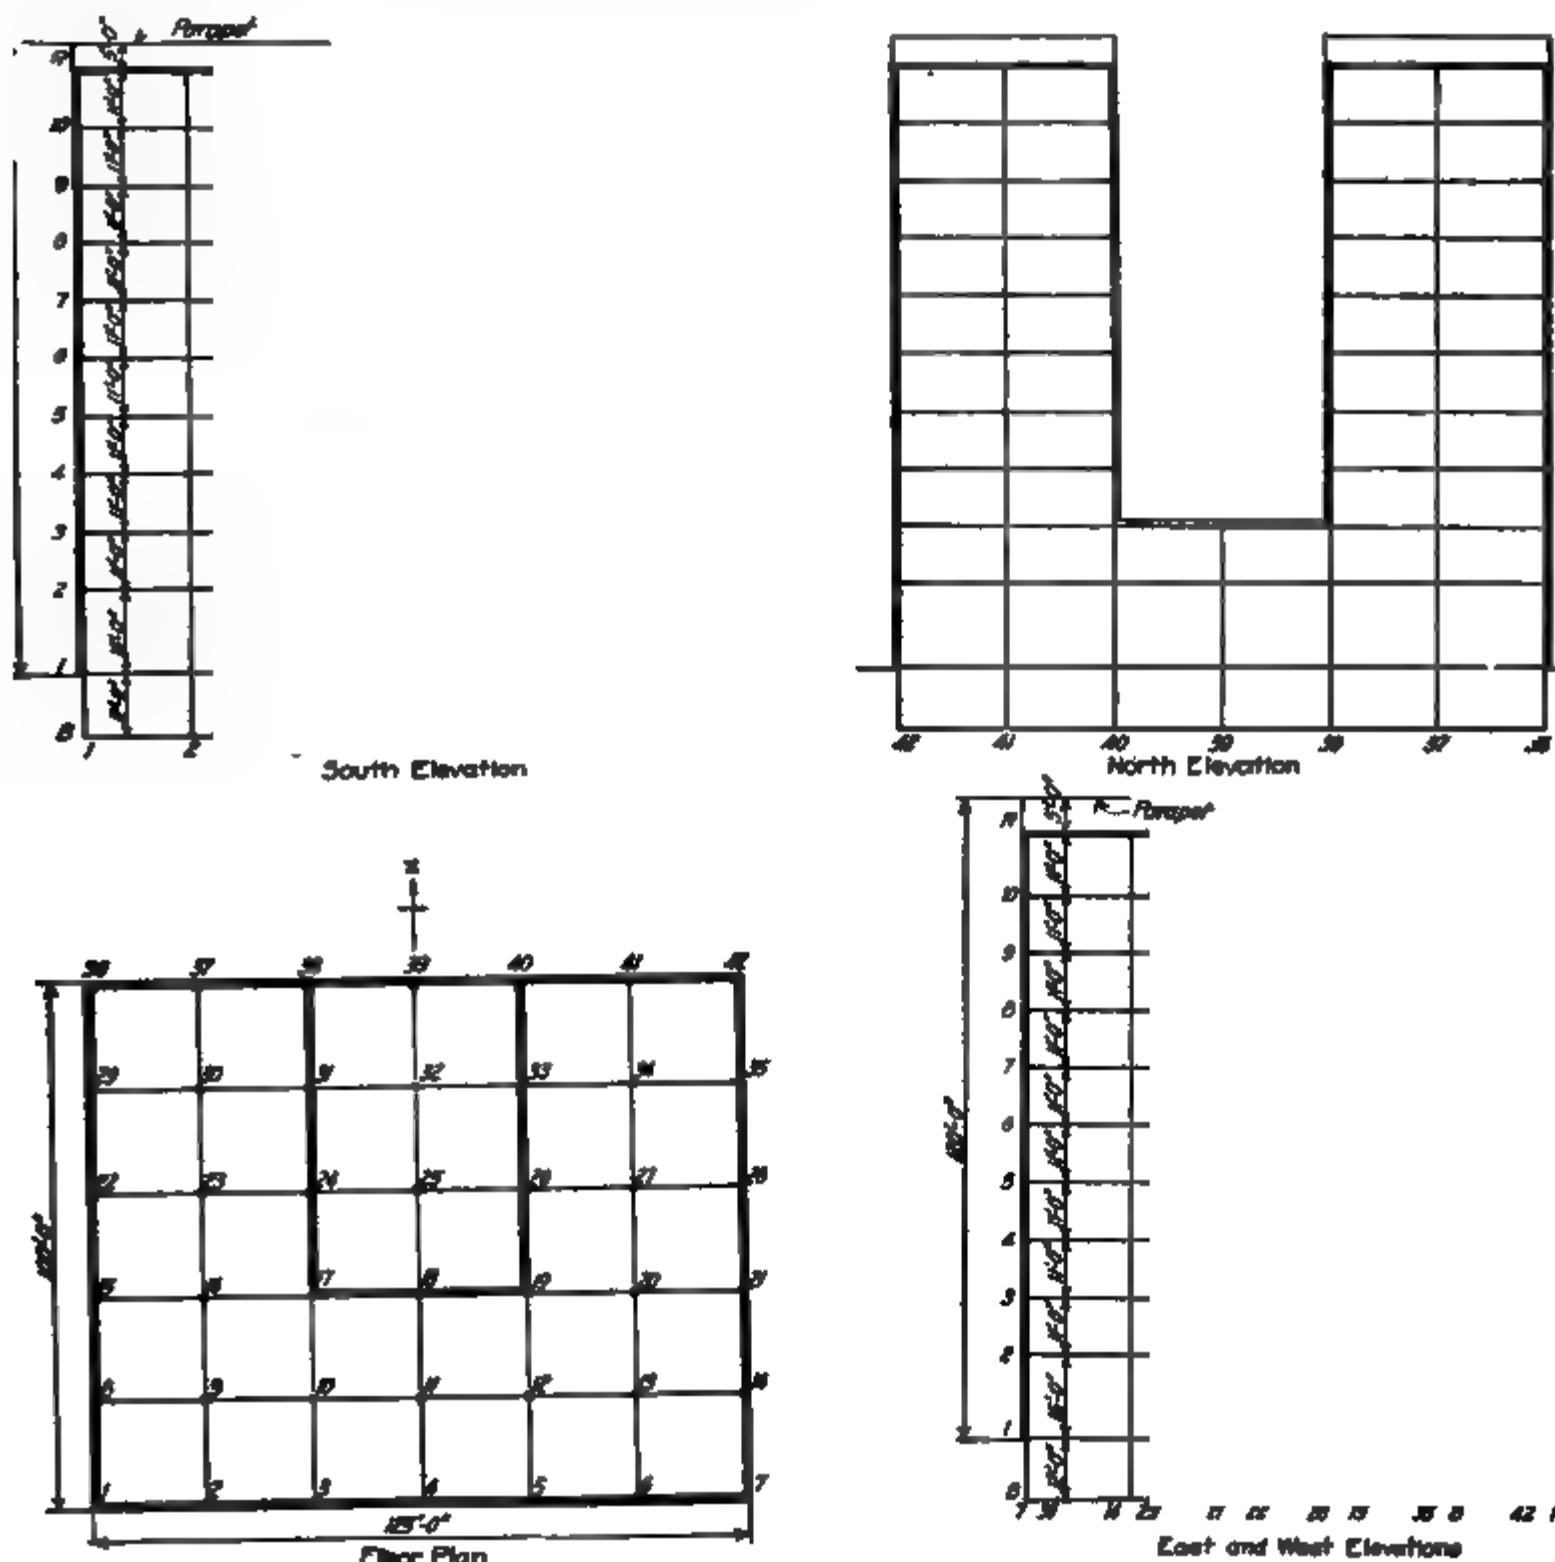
Diagram of plan and elevations for computing wind load moments and shears.
